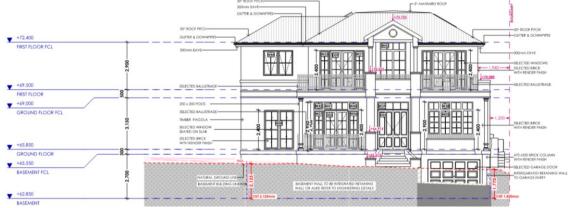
Proposed west (front elevation) plan (Source: Fyffe Design)
